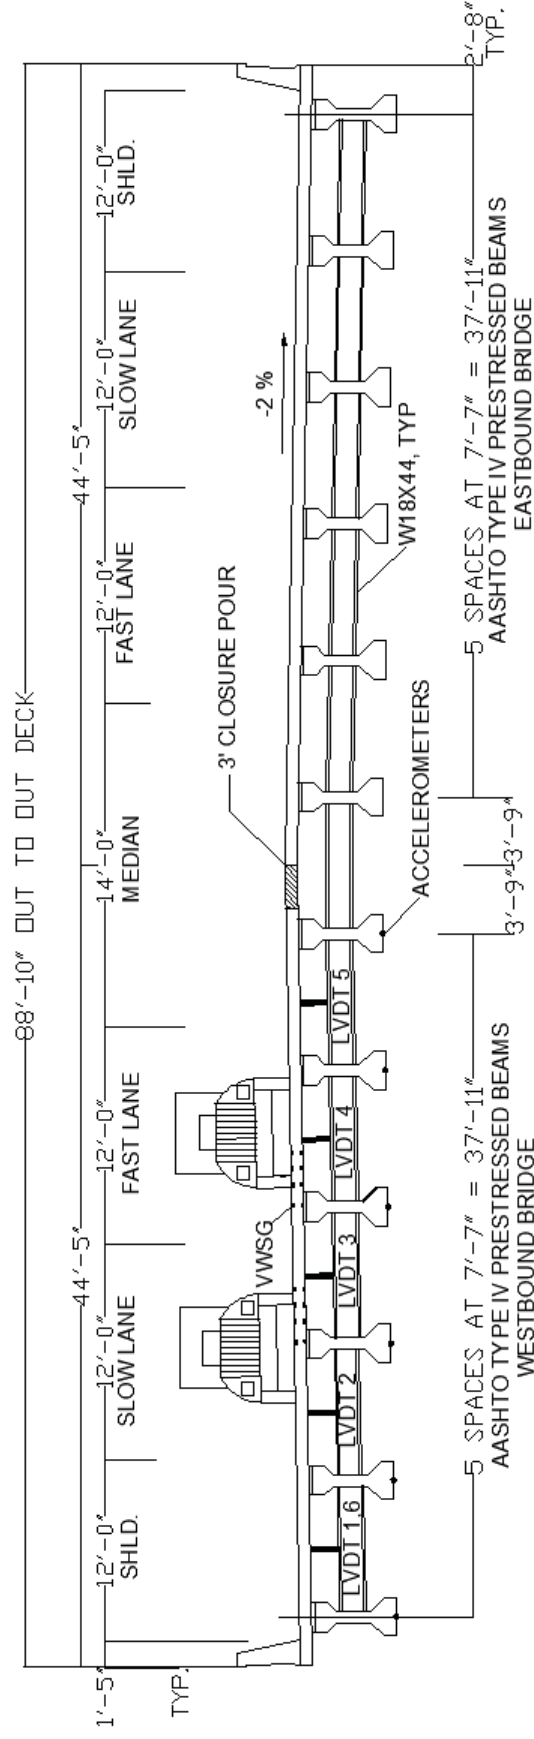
Elevation of Beaver Creek Bridge showing deck, girders and instrumentation
